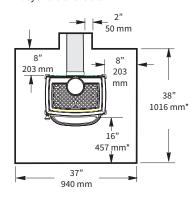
Minimum Hearth Dimensions. * Denotes requirement for Canada.
